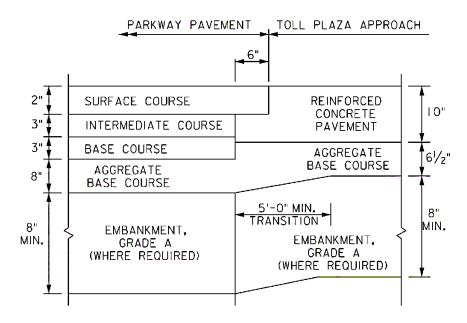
24: PARKWAY TOLL PLAZA-TRANSVERSE / LONGITUDINAL PAVING INTERFACE
